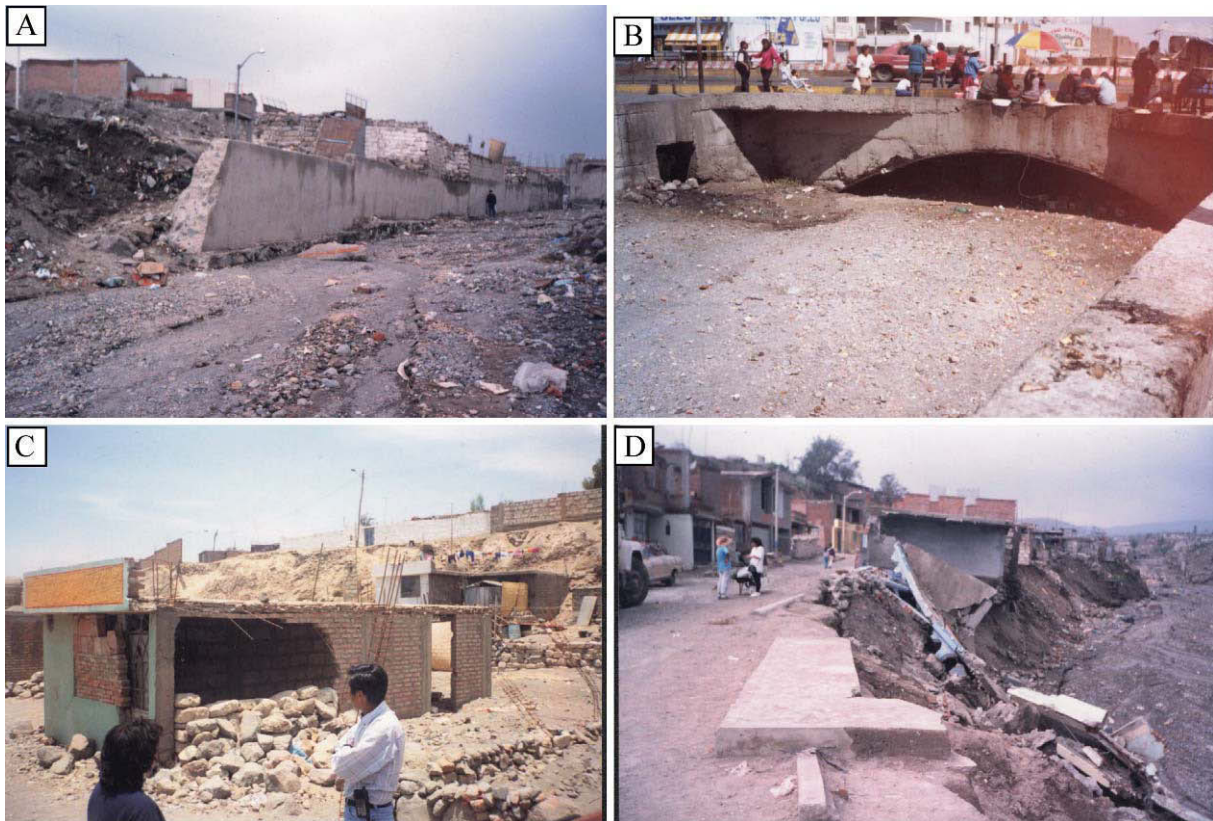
A: Destruction of a retaining wall. B: Inundation of Puente Avenue Jesus from Quebrada Mariano Melgar. C: A house damaged by the hyperconcentrated flow debris in the district of Mariano Melgar. D: Houses collapsed into Quebrada Mariano Melgar after channels were undermined by the hyperconcentrated flow. Photographs obtained from Victor Rodriguez.
